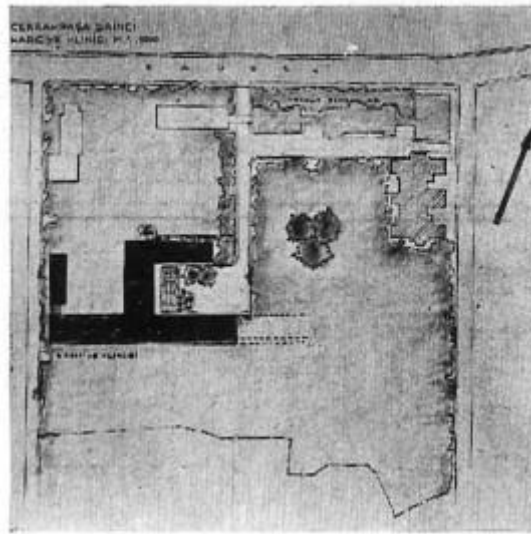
External Diseases Department, Cerrahpaşa Medical Faculty Hospital, Site Plan
